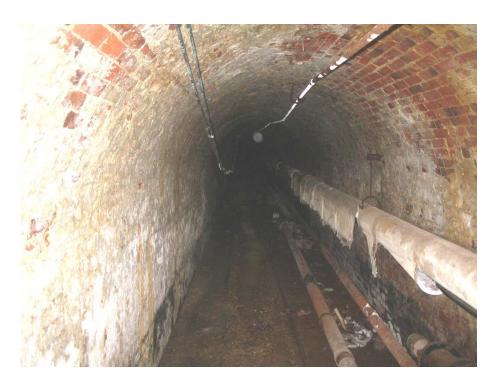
General view looking east from elbow below Building 44; Note debris on floor and corrosion on pipes
